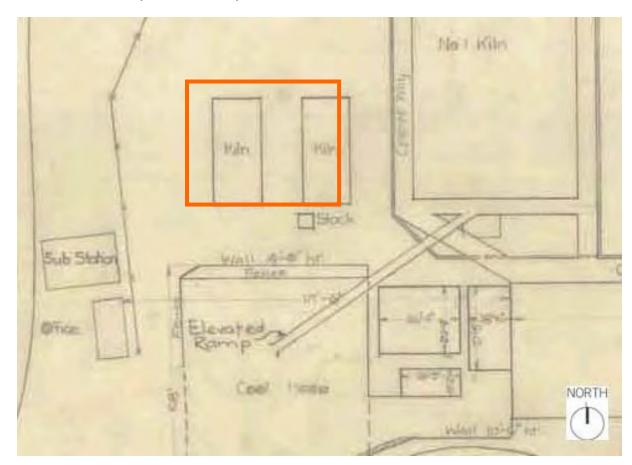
Detail of 1947 site plan, indicating the location of the two 'temporary' Downdraught kilns, to the south of the Staffordshire Kiln ('No. 1 Kiln'). (Source: National Archives of Australia)
